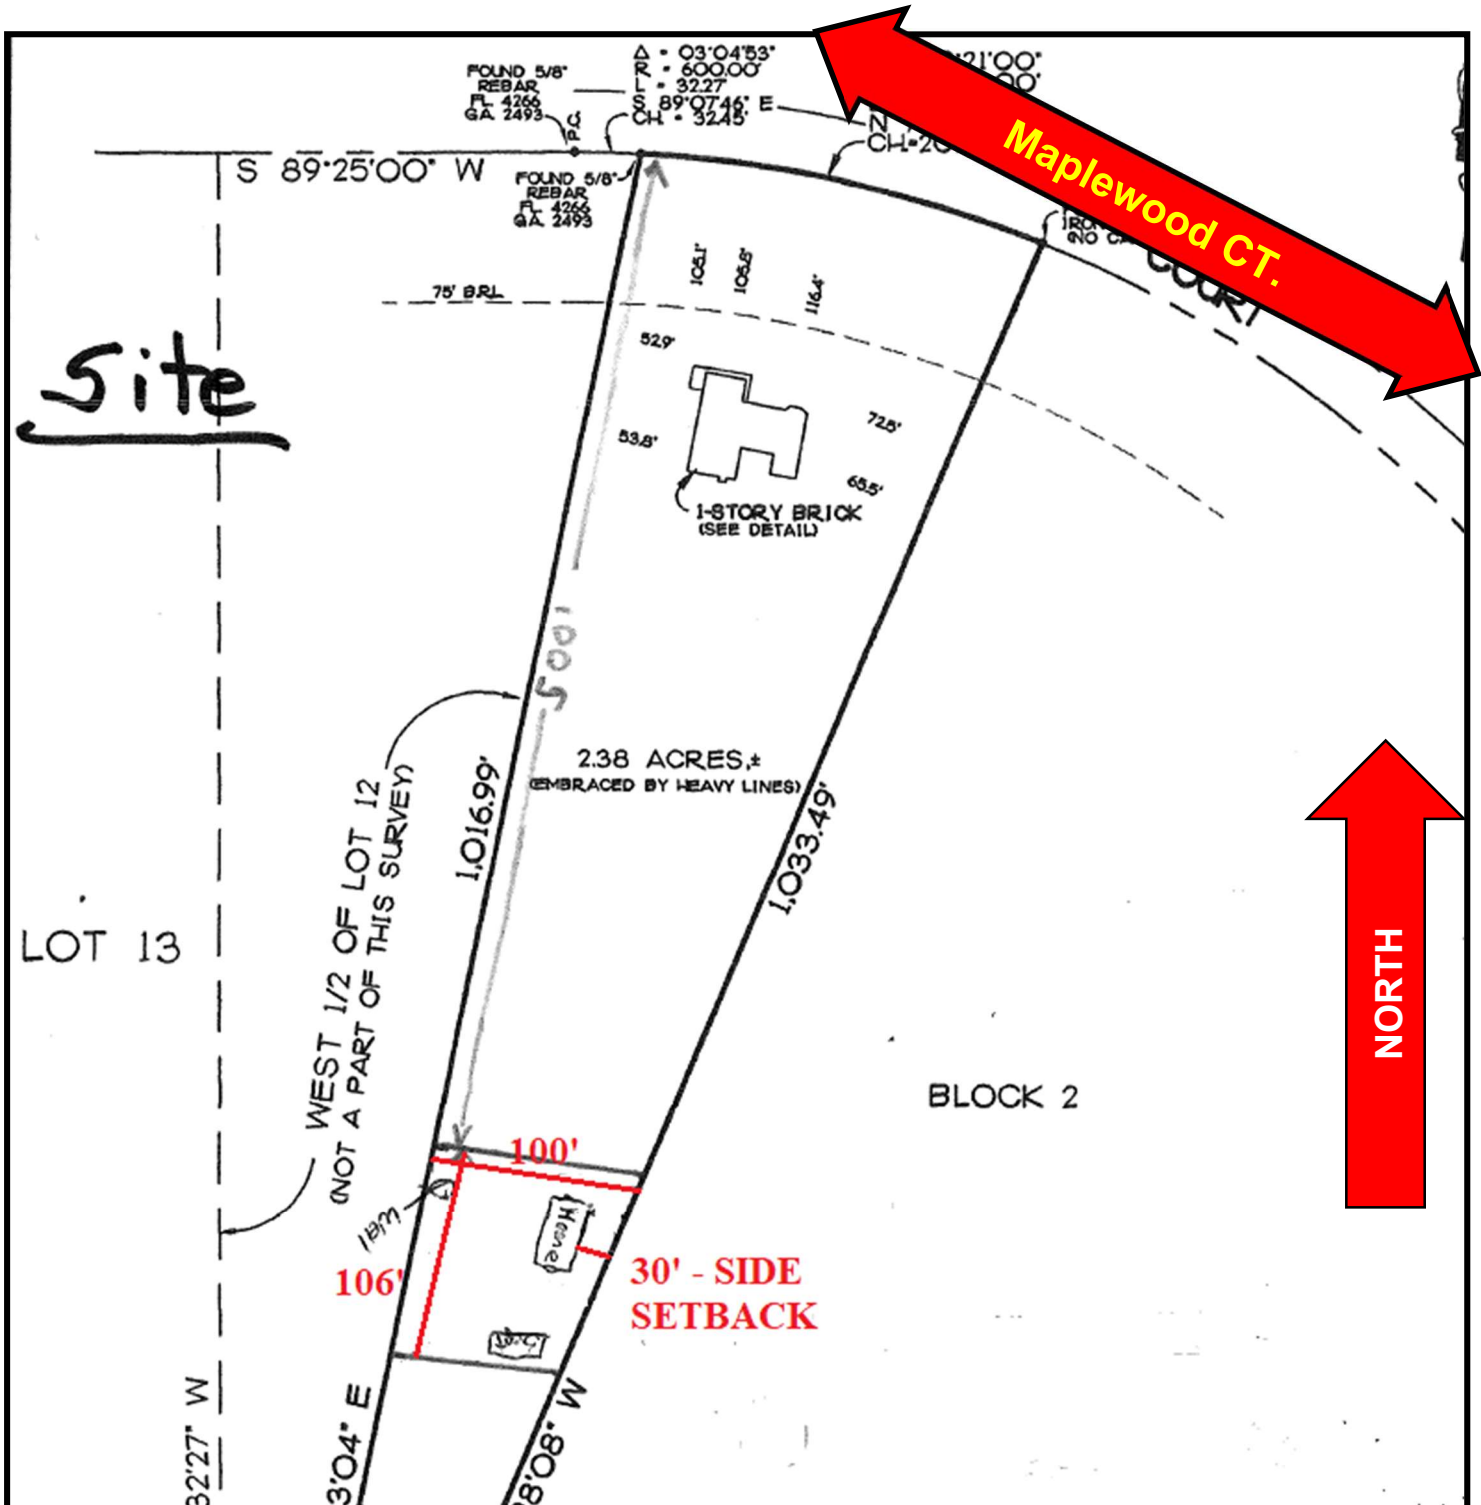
Conceptual site plan -setbacks meet or exceed requirements for the Open Rural Zoning District of 35/15/25 (Front/Side/Rear)
